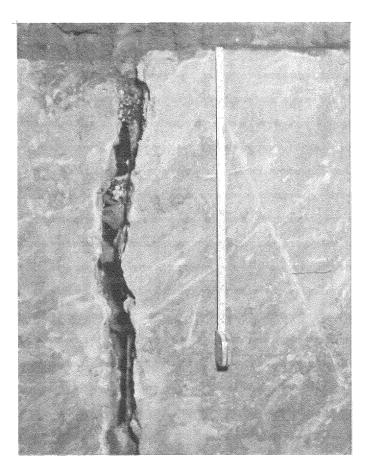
Top of break in north wall of drainage inspection chamber at Station 0+70.3, showing exposed reinforcing steel.
